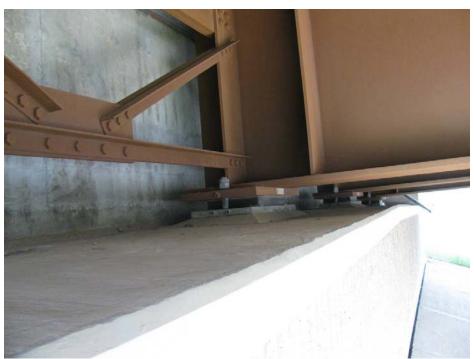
Looking northwest at the bridge girder bearings; no signs of distortion in the steel girder bearings
